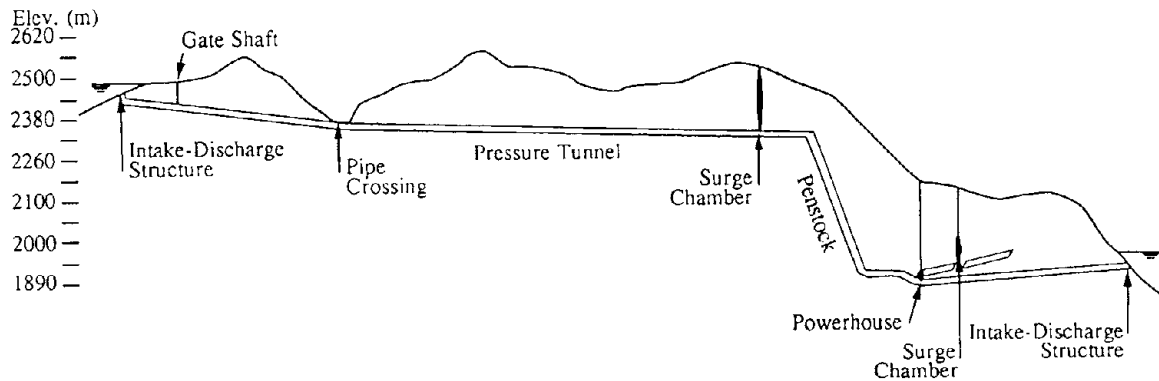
Underground features of the Helms Pumped Water Storage Plant.
